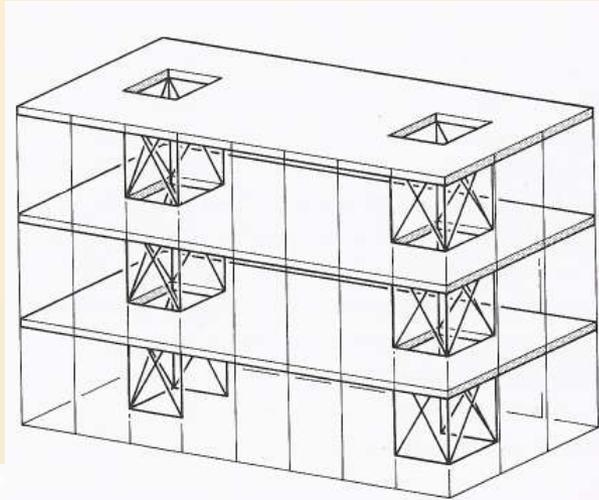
Concrete floor slabs are normally used as horizontal-plane bracing of the diaphragm type which acts in conjunction with diagonal bracing in the vertical planes.
